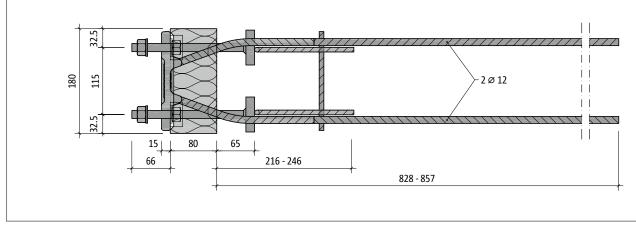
Schöck Isokorb® T type SQ-V3: Plan view
